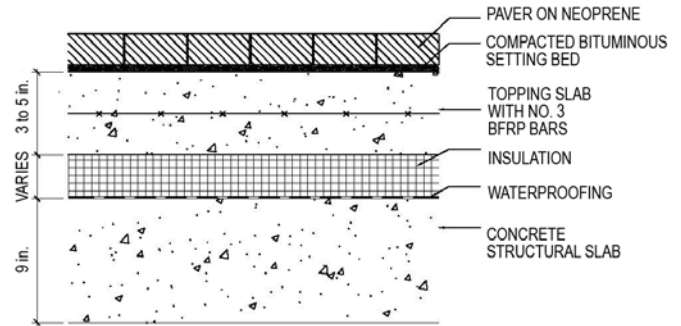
Section of topping slab (Note: 1 in. = 25 mm)
